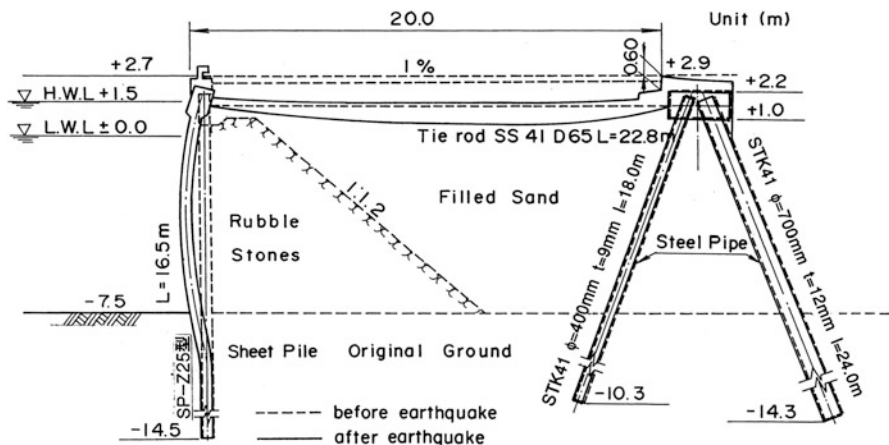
Damaged sheet pile quay wall at South Fishery Wharf, Kushiro Port, during 1993 Kushiro-oki earthquake (Iai et al. 1994)
